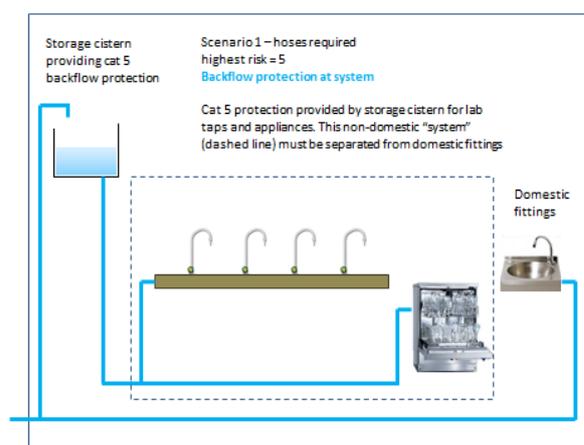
Storage cistern providing backflow protection to multiple installations in a laboratory
